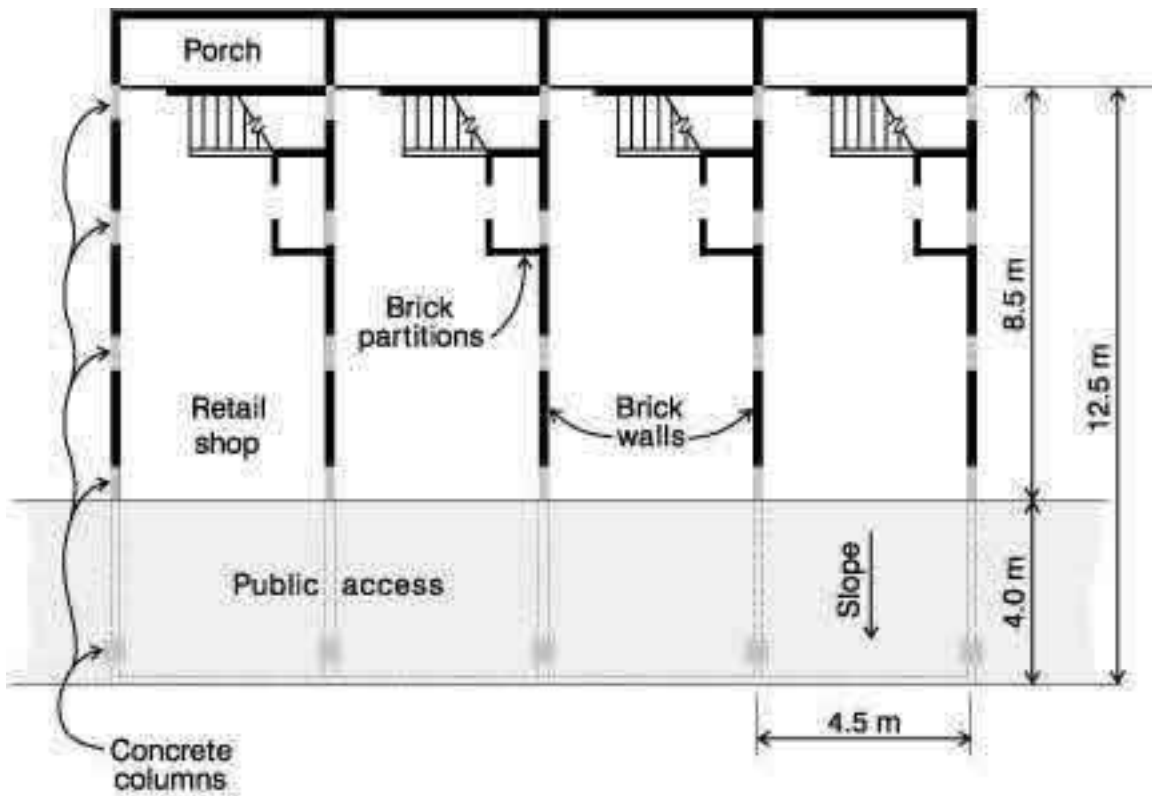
B: Plan of a Typical Building - Ground Floor Level (Source: EERI 2001)
